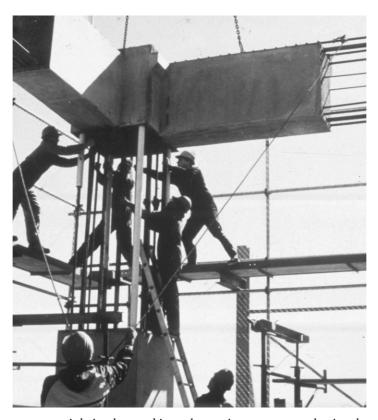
Beam corner unit being lowered into place using temporary plastic tubes as guides (Courtesy of J. Restrepo)
